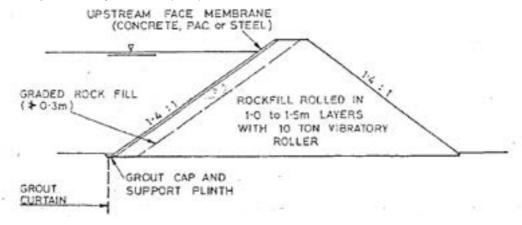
Typical CFRD configuration (GHD, 1978)
